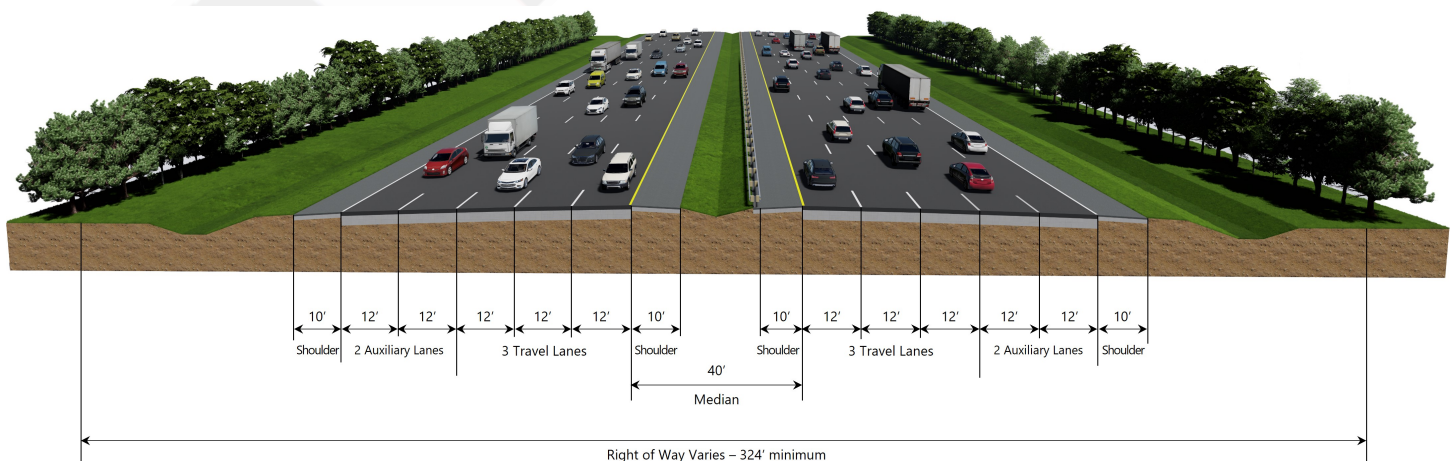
I-95 Existing Typical Section from I-295 to Philips Highway (US 1)
